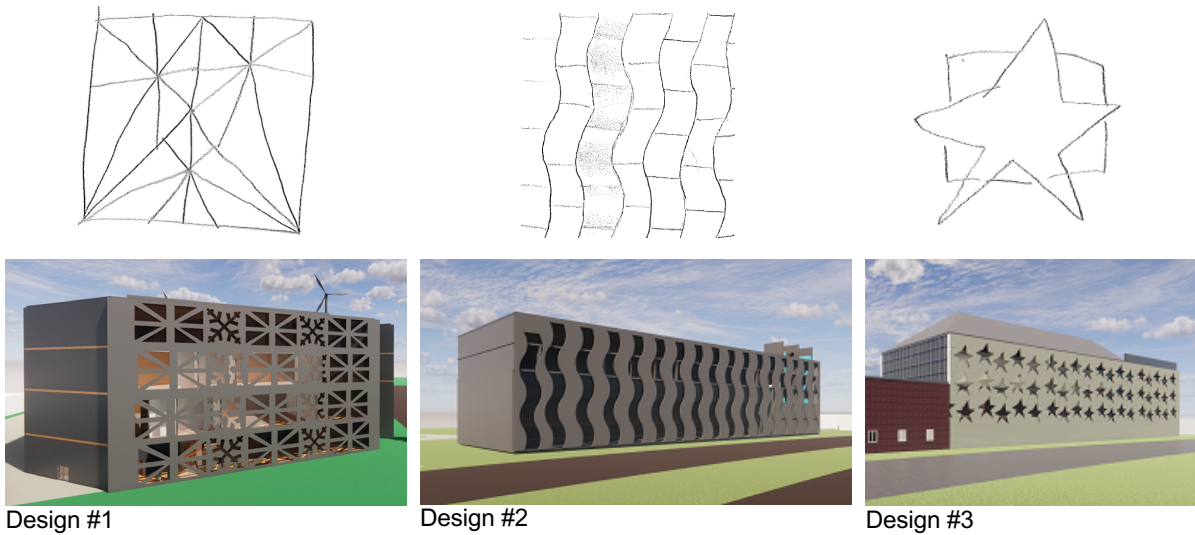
Design of South-facing shaded wall by teams showing sketches and walls. Source: (Author 2024)
